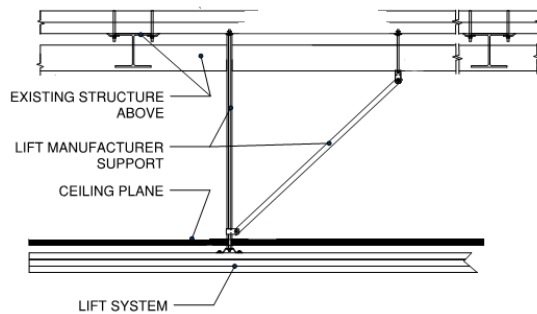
The illustration above is an example of a shop drawing construction diagram for a manufacturer provided structural support connected to the existing building structure. The “Existing Structure Above” is designed by a structural engineer and furnished and installed by a construction contractor. The manufacturer would provide support under the “Additional Structural Support”. These two support systems need to be coordinated by the VA project manager.
